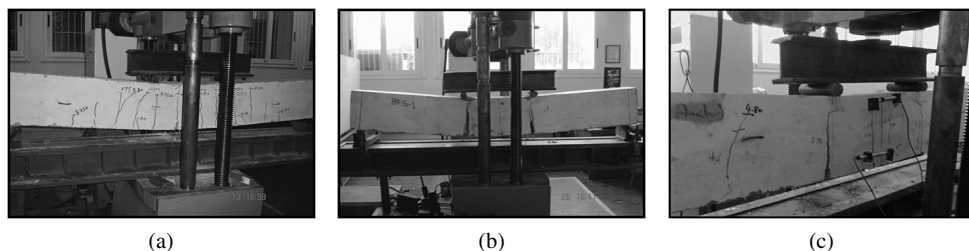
The typical crack pattern for tested beams. (a) Control beam. (b) Beams with two and three anchors. (c) Beam with five anchors.
